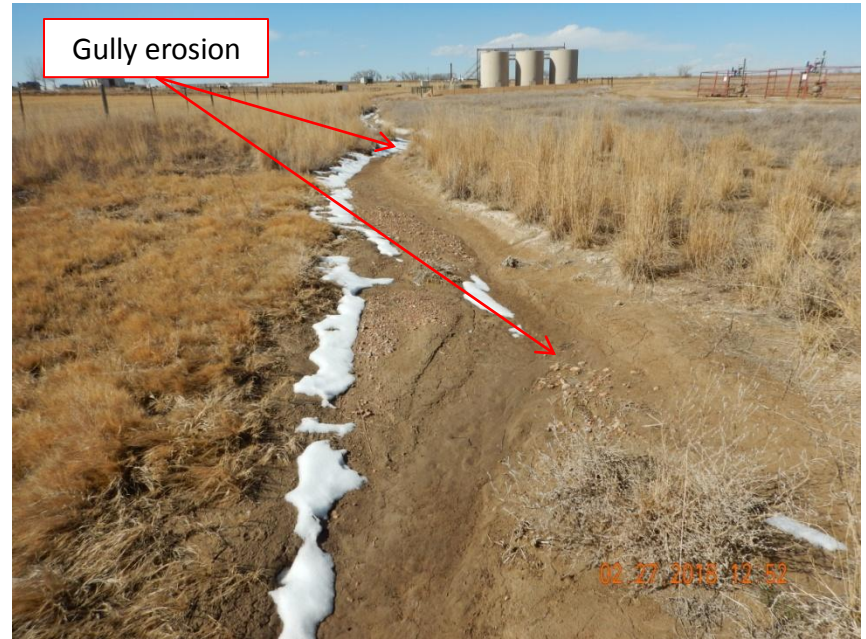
Photo taken east off location, facing West. Gully erosion evident from stormwater runoff from location.
